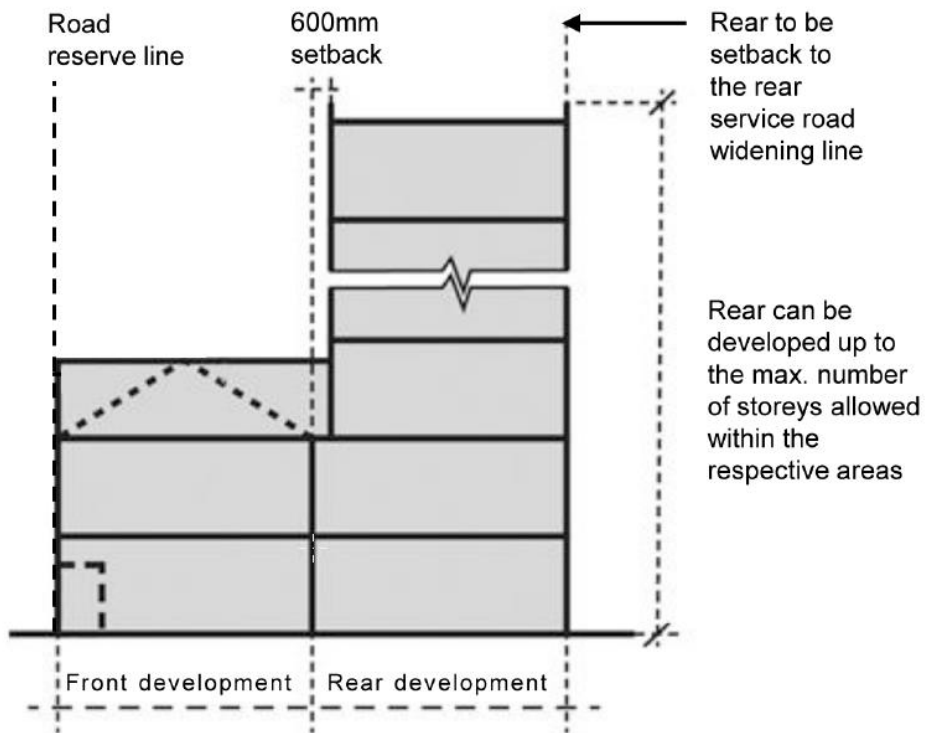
Type 2 Infill Site to align with front façade of adjacent conserved buildings
